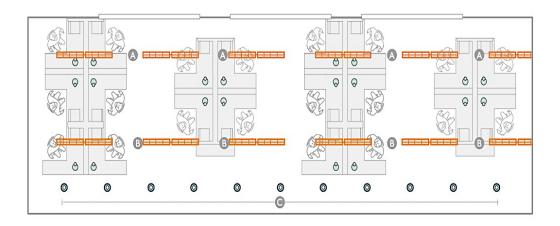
Optima Project Open Plan Office Floorplan Recessed Scheme (Philips, 2012)
